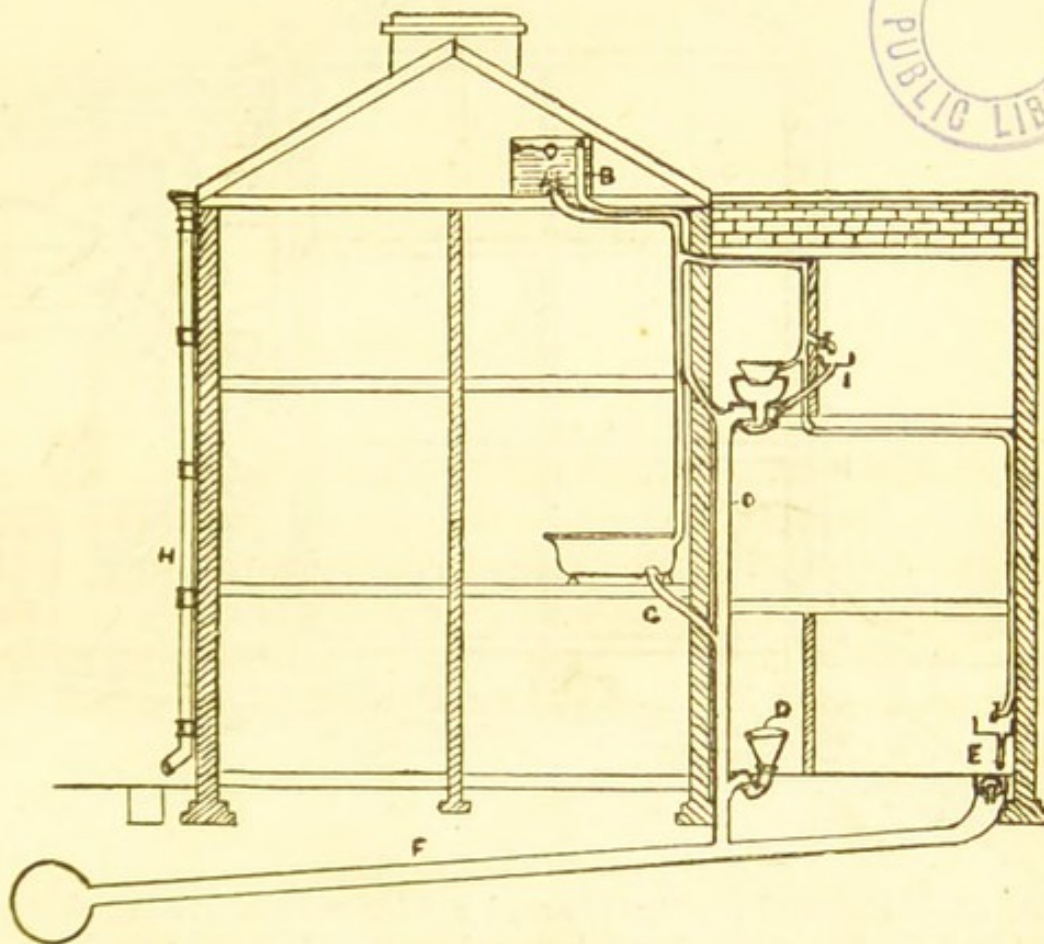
Vertical Section through a Nine-roomed House, showing a Bad System of Sanitary Arrangements.
